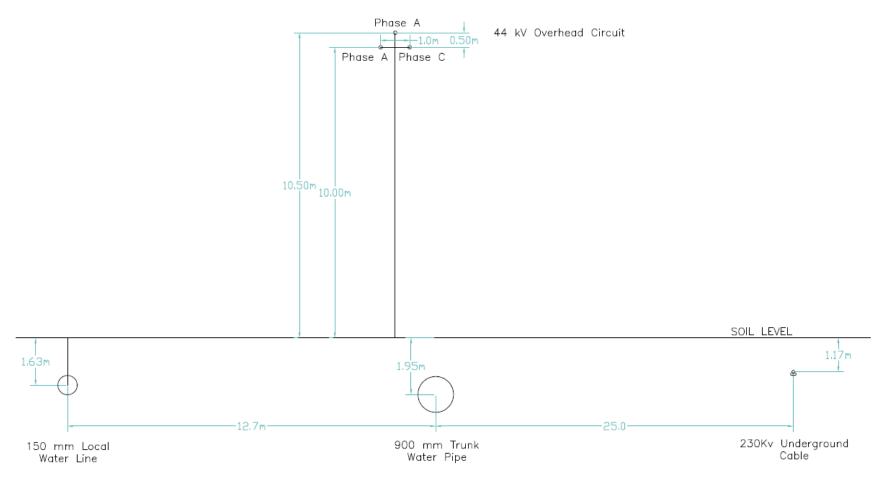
Cross Section of Proposed Cable and Pipelines
